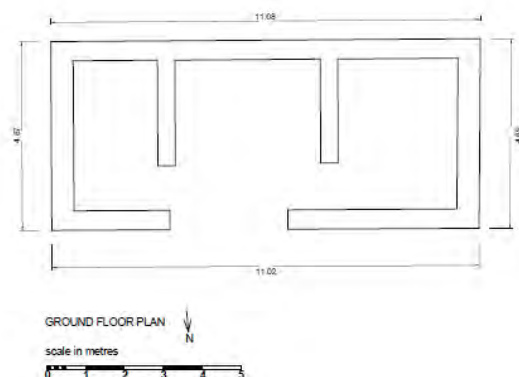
Ground floor plan, drawn by Lynne Seignot.
